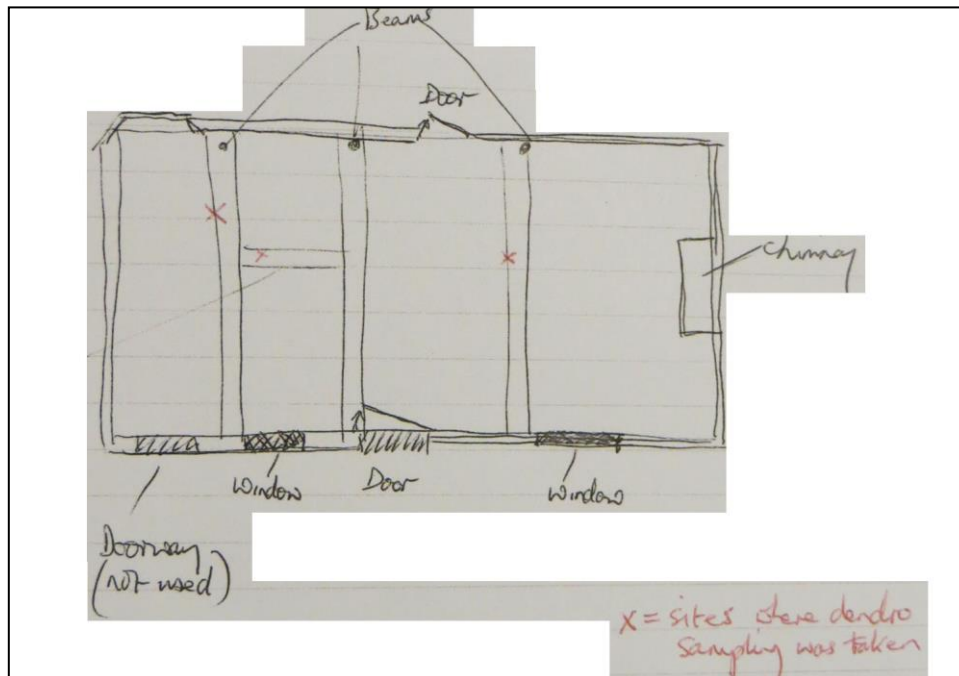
Sketch plan of the ground floor showing the timbers sampled
